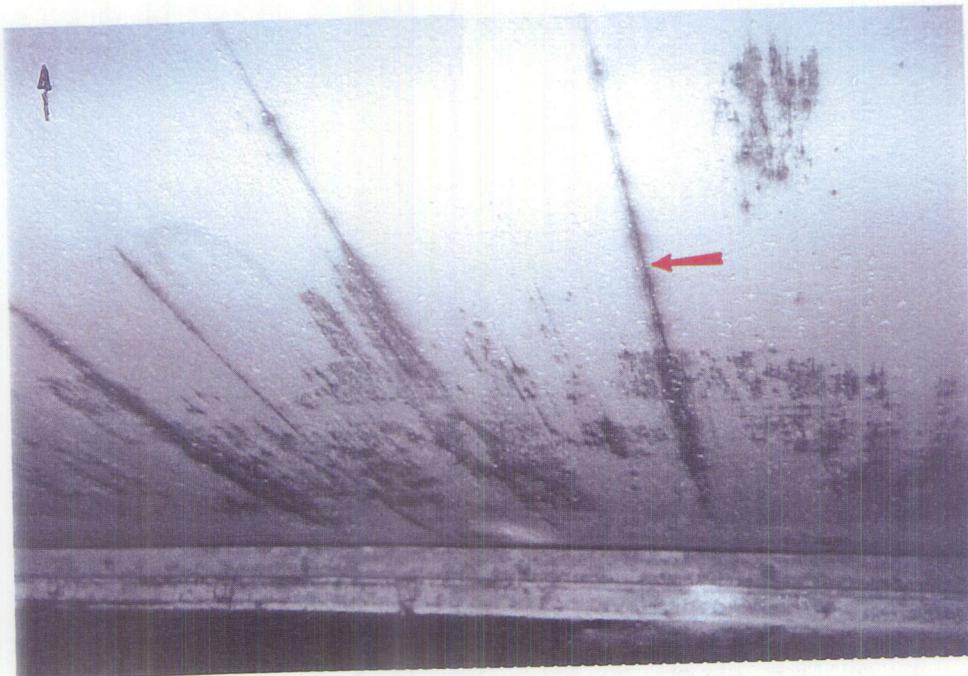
Morris Dam - 70' x 18' Drum Gate #3 - Upstream faceplate, looking towards bottom edge. Left arrow points to scrap mark.. - (9/10/98).
